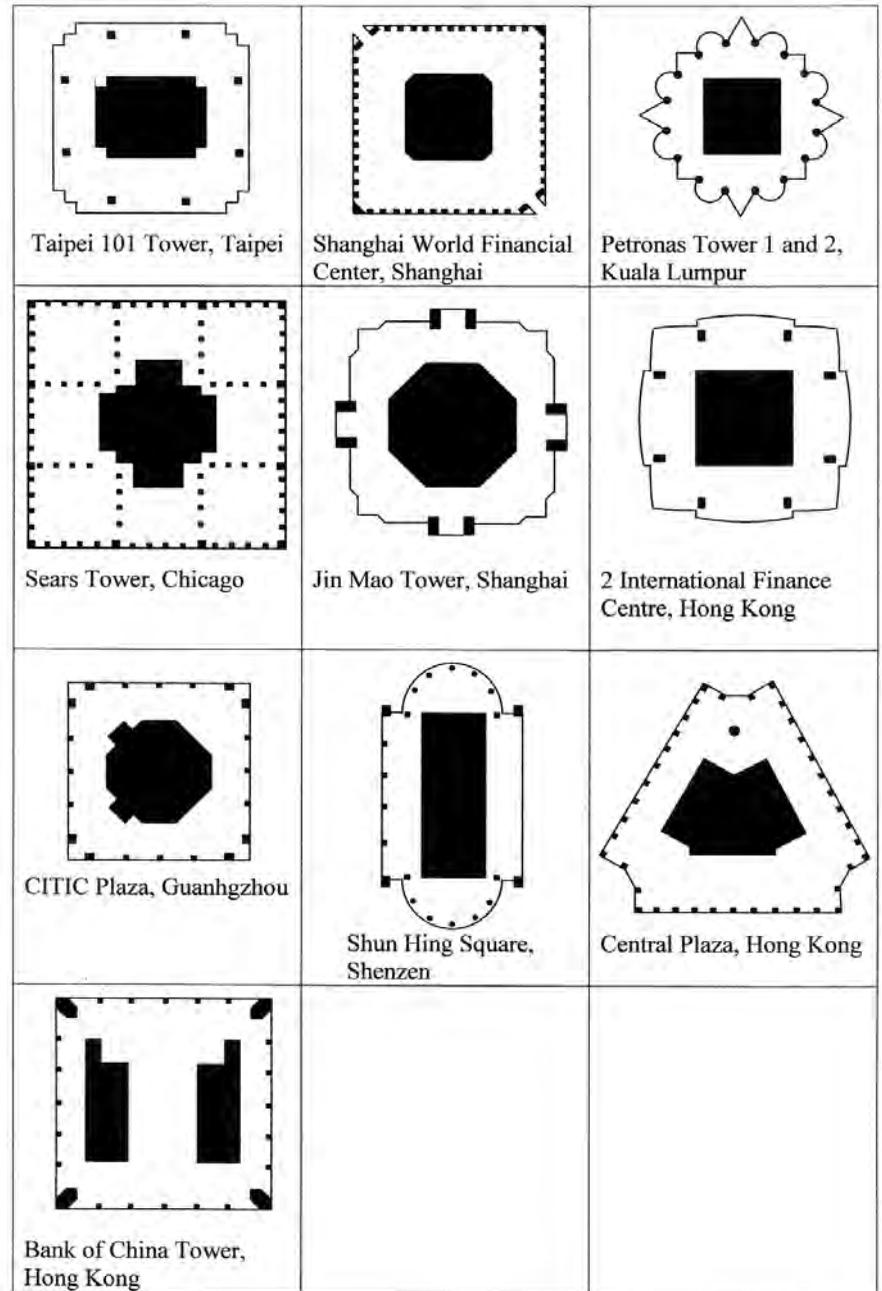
Geometry of typical floor plans of ten tallest office buildings of the world.
